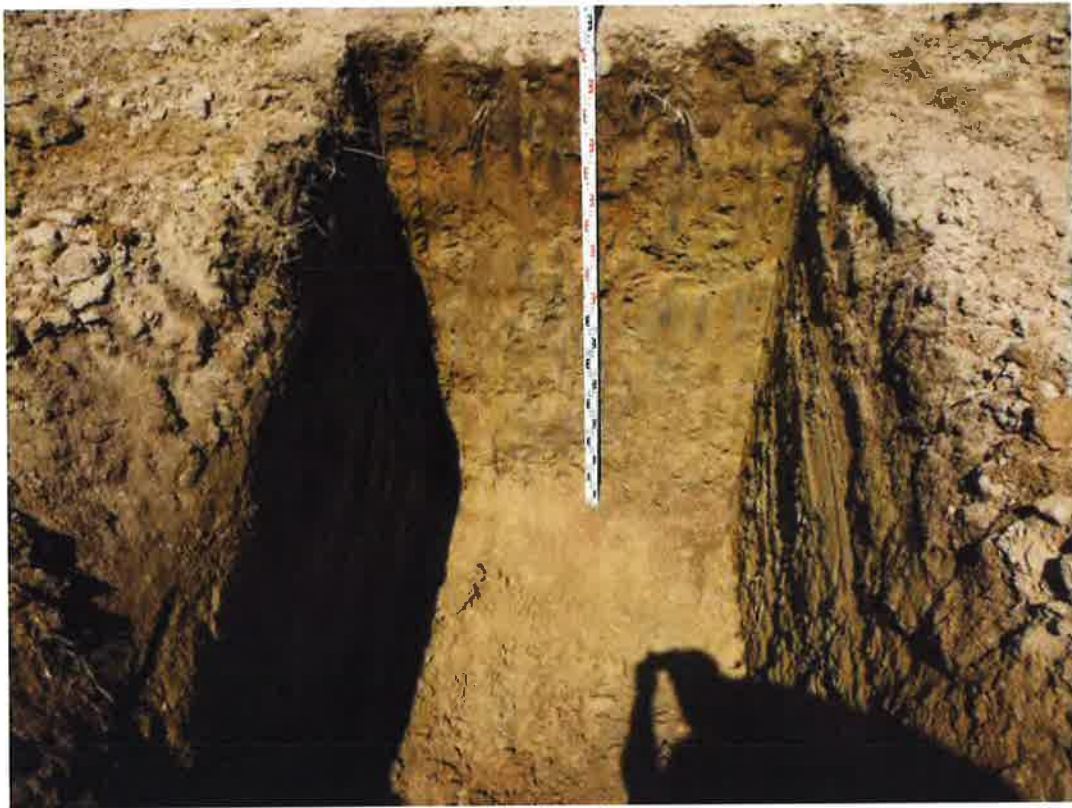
Test Pit: 5. Overall view of test pit upon completion.
